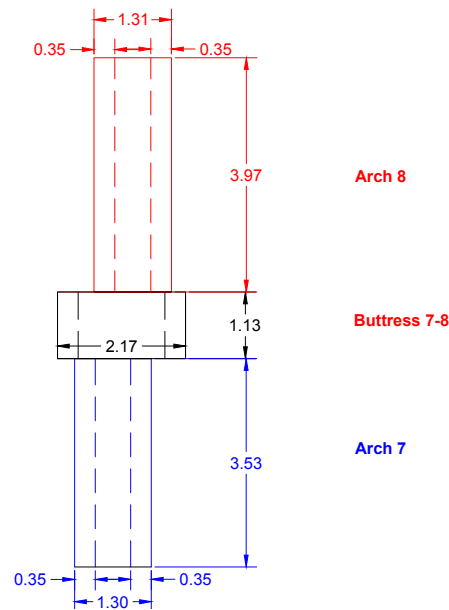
Plan view of Arch 7, Buttress 7-8 and Arch 8 foundations
